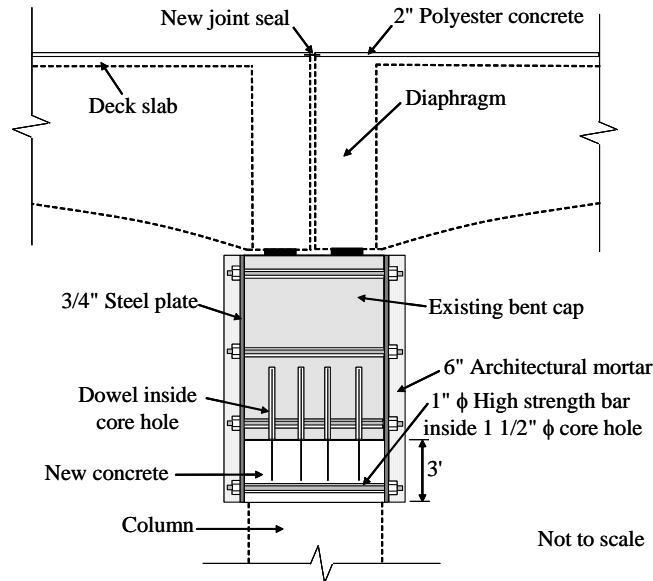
Retrofitting of Bent Caps by Concrete Bolsters
